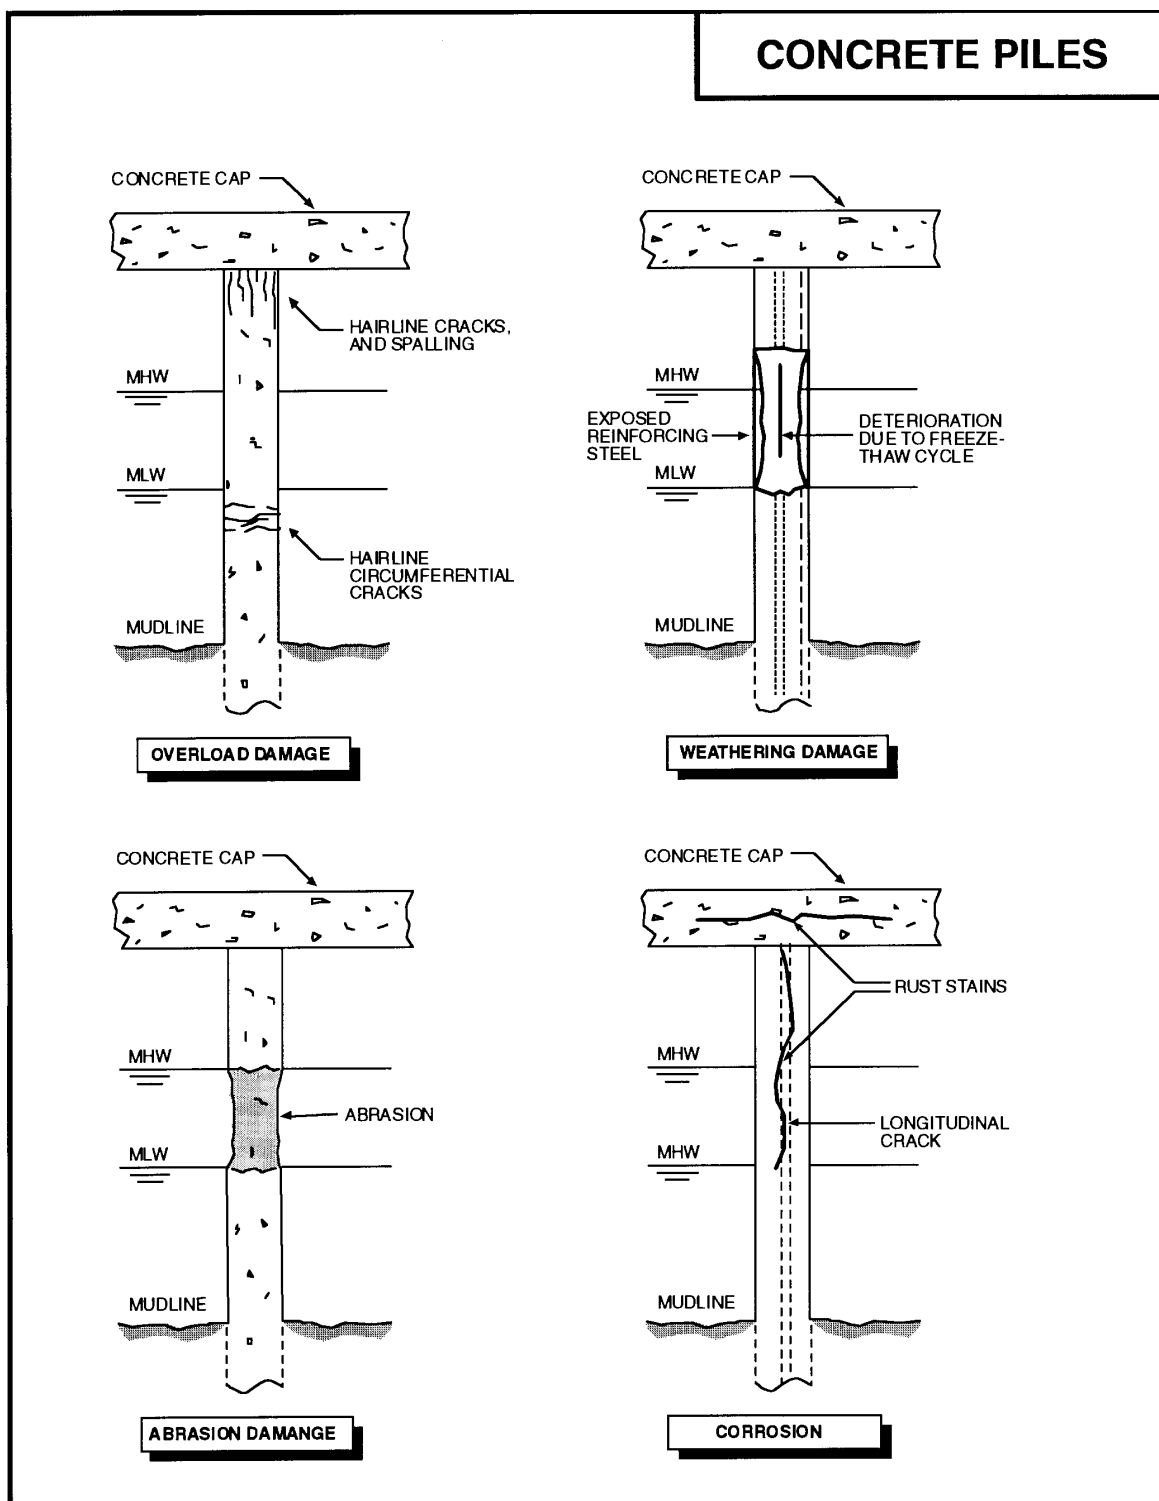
Typical Damage to Concrete Piles from Non-Biological Sources
